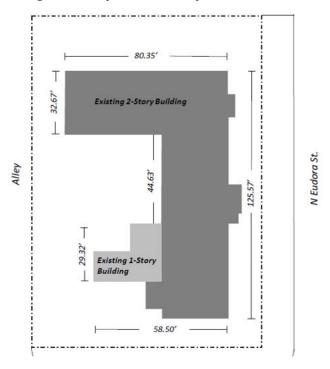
Existing Building Defined within PUD-G 30 (dimensions are approximate)
